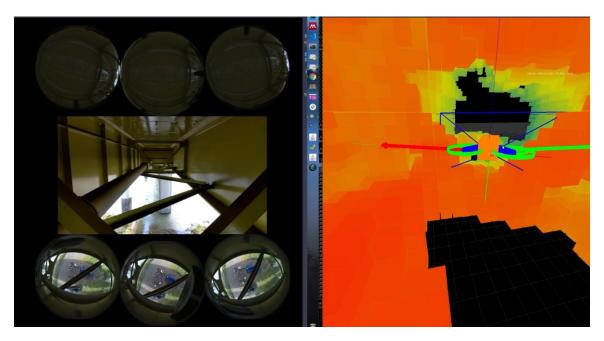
Skydio 2 Generated Point Cloud Environment Between Bridge Beams
